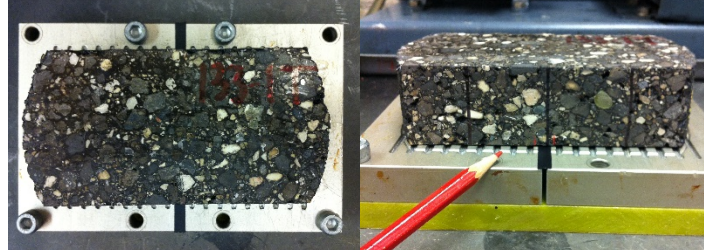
Texas overlay test setup illustrating specimen glued to an aluminum plate and underlying assembly with a joint opening and closing at a specified rate of displacement
